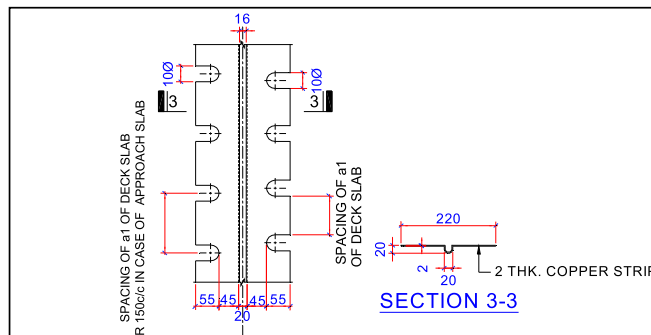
Sketch of Copper Strip Used in Filler Type Expansion Joint
